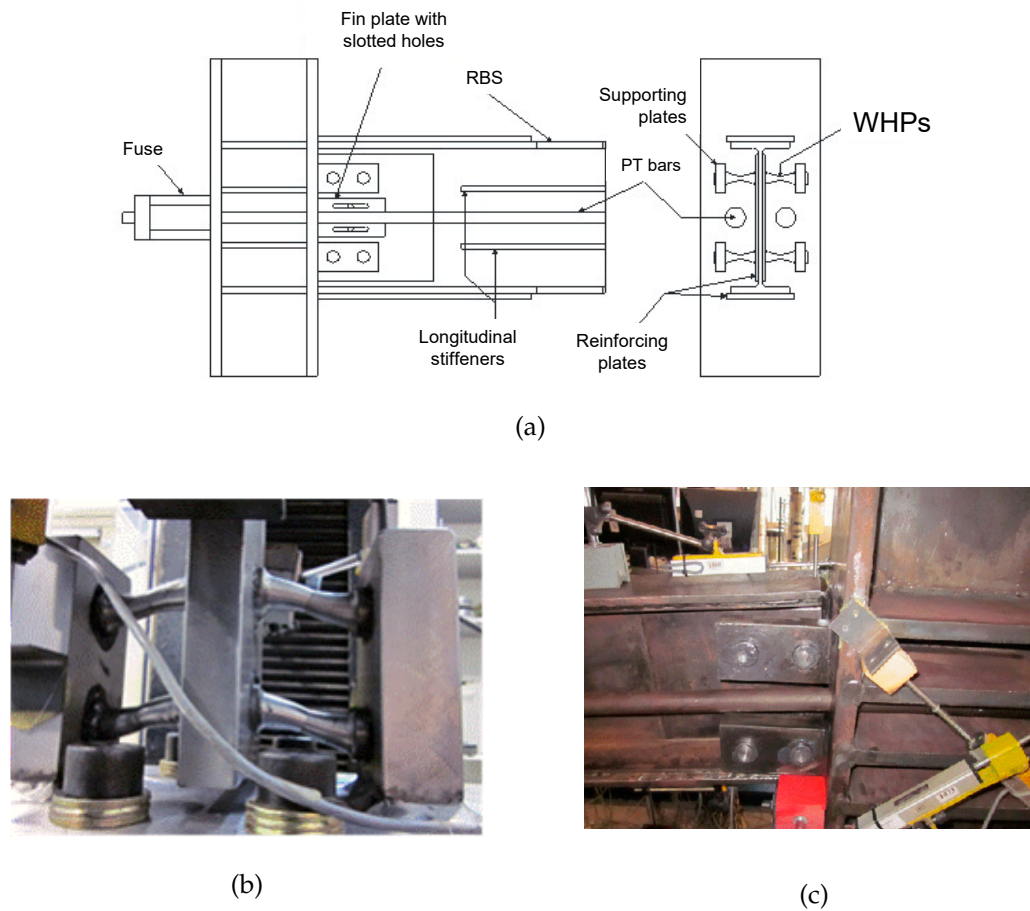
Post-tensioned connection with WHPs (Vasdravellis et al. 2013): (a) geometry details; (b) component test on WHPs; and (c) large-scale test
